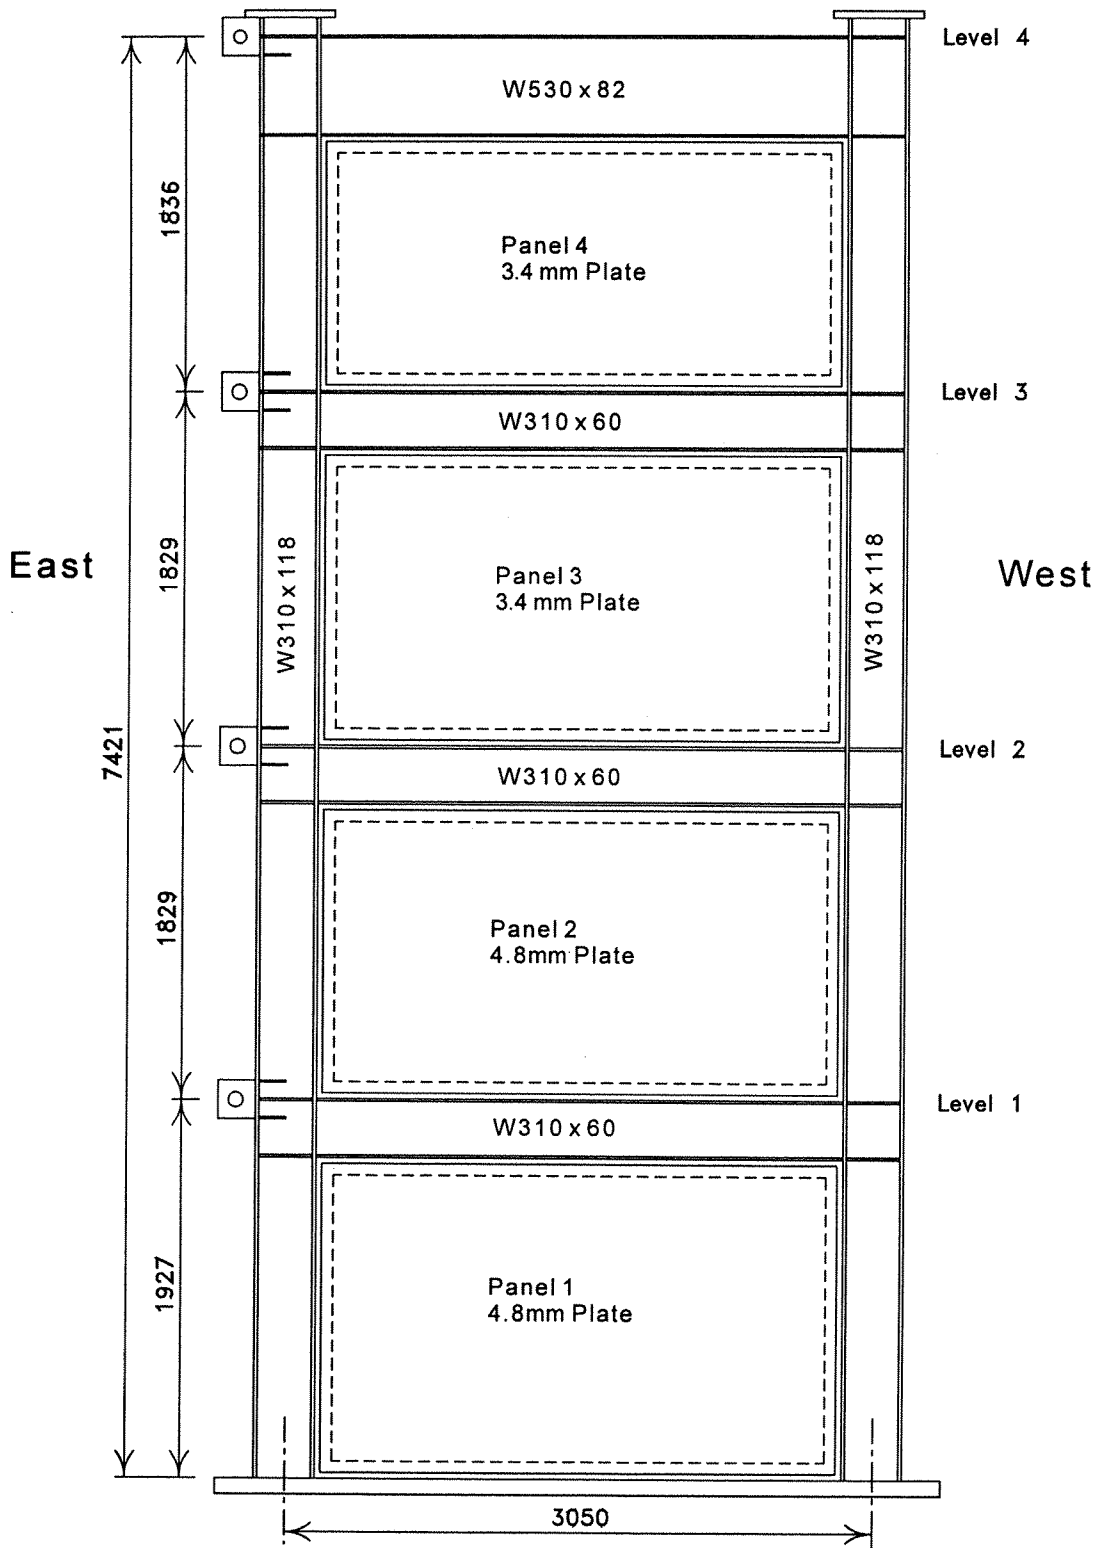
Steel Plate Shear Wall Test Specimen (North Face)
